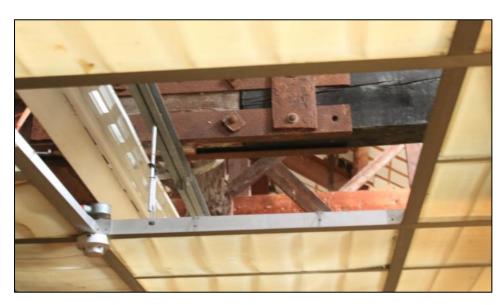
View east through a missing ceiling tile at part of the roof structure beyond.
